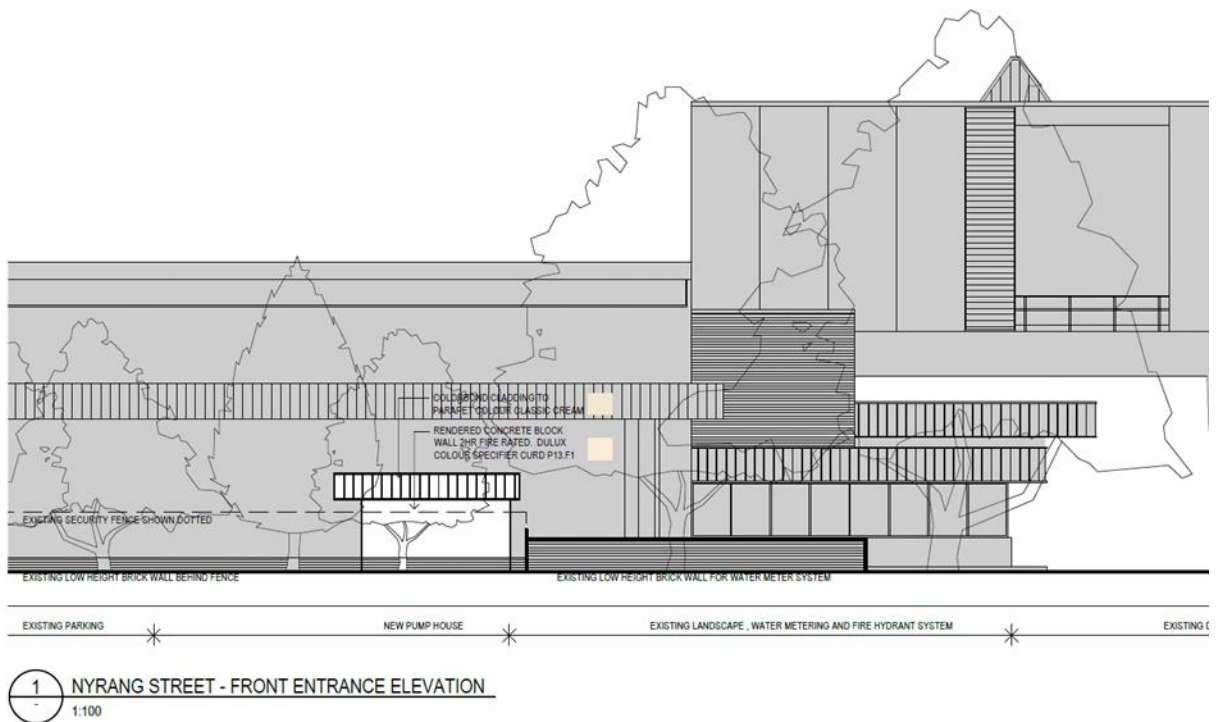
Elevation of proposed fire pump facility (for full elevation see Appendix B)
